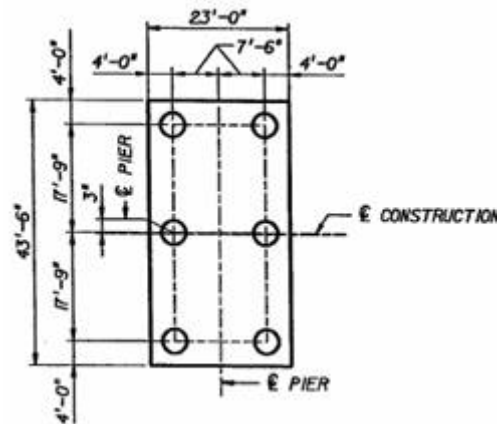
US1 Jewfish Creek Substructure with 6 ft Drilled Shafts
